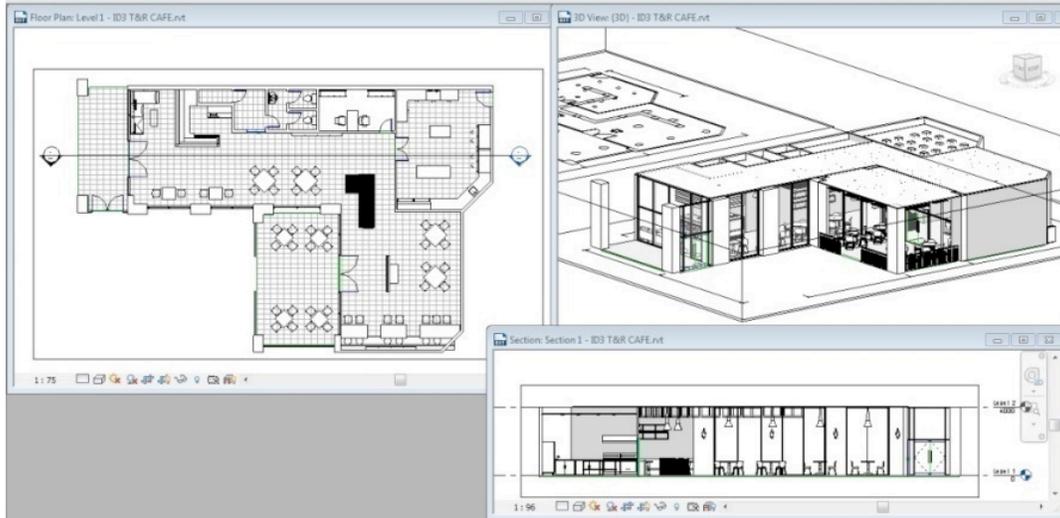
The modelling process of the building from an AutoCAD plan using parametric families in Revit.
